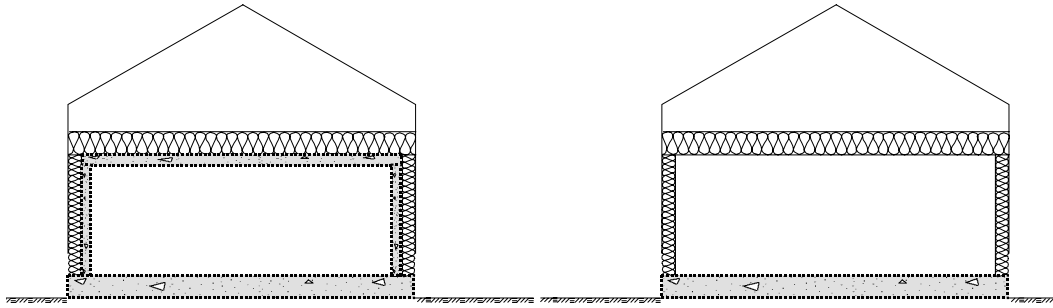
The left-hand figure represents a building with a high thermal capacity. The walls and ceiling consist of concrete, with insulation on the outside. The right-hand building has low thermal capacity, with no concrete in the walls or ceiling.
